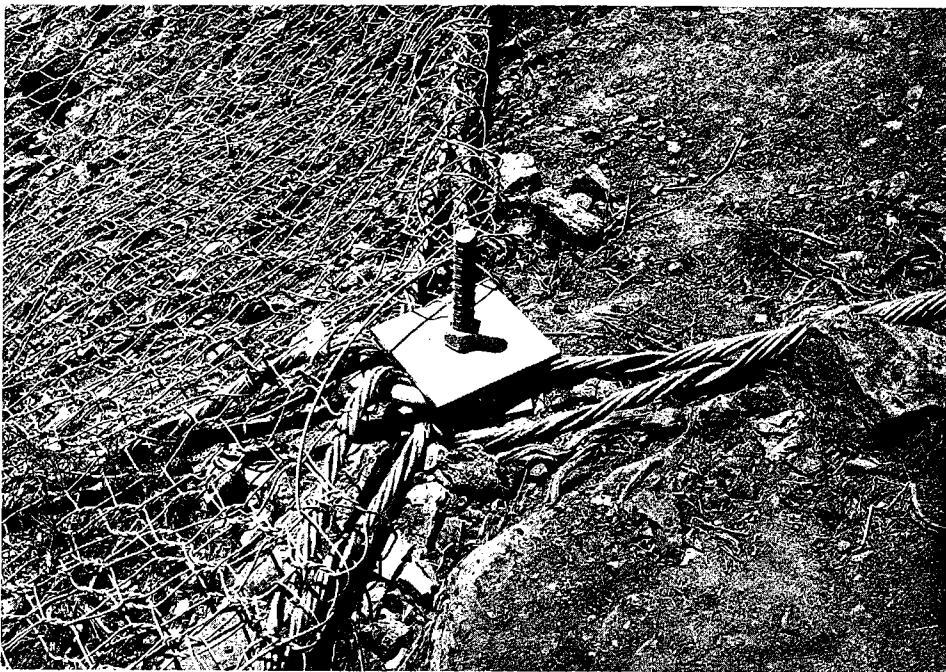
Detail of anchor bolt to which wire ropes are connected.
